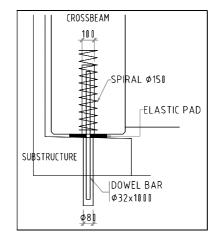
Anchor Bar Type Aseismatic Connector
